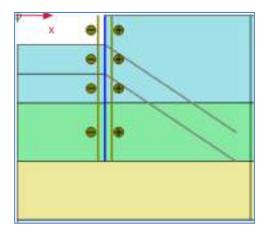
Phase 1, excavation and activation of the diaphragm wall.
